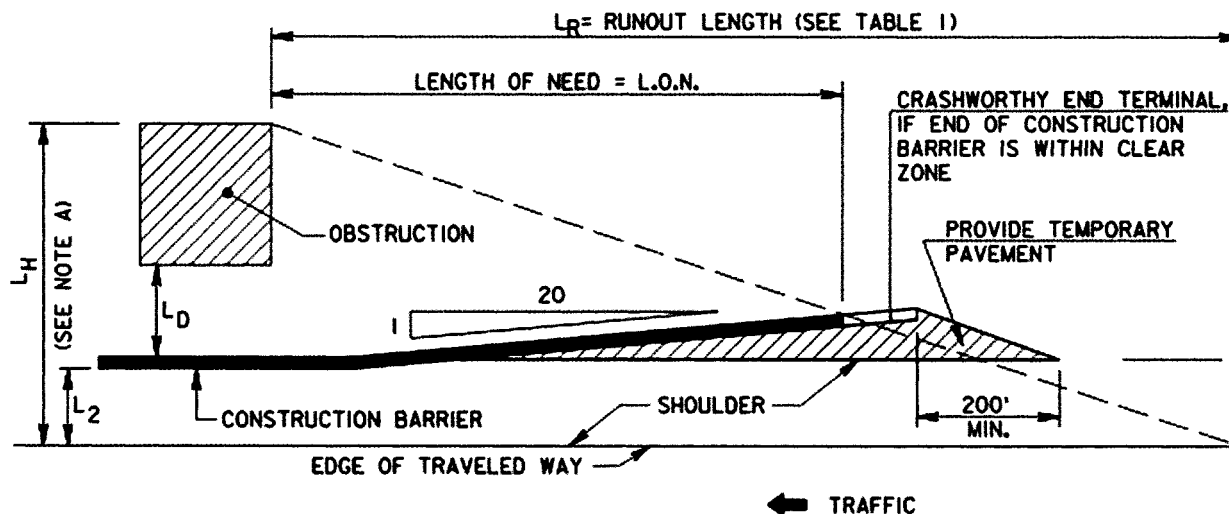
1 LENGTH OF NEED OF PRECAST CONCRETE CONSTRUCTION BARRIER
